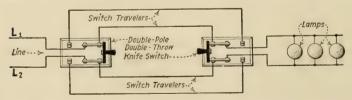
Two horizontally-mounted double-pole double-throw knife switches for two-location control.
